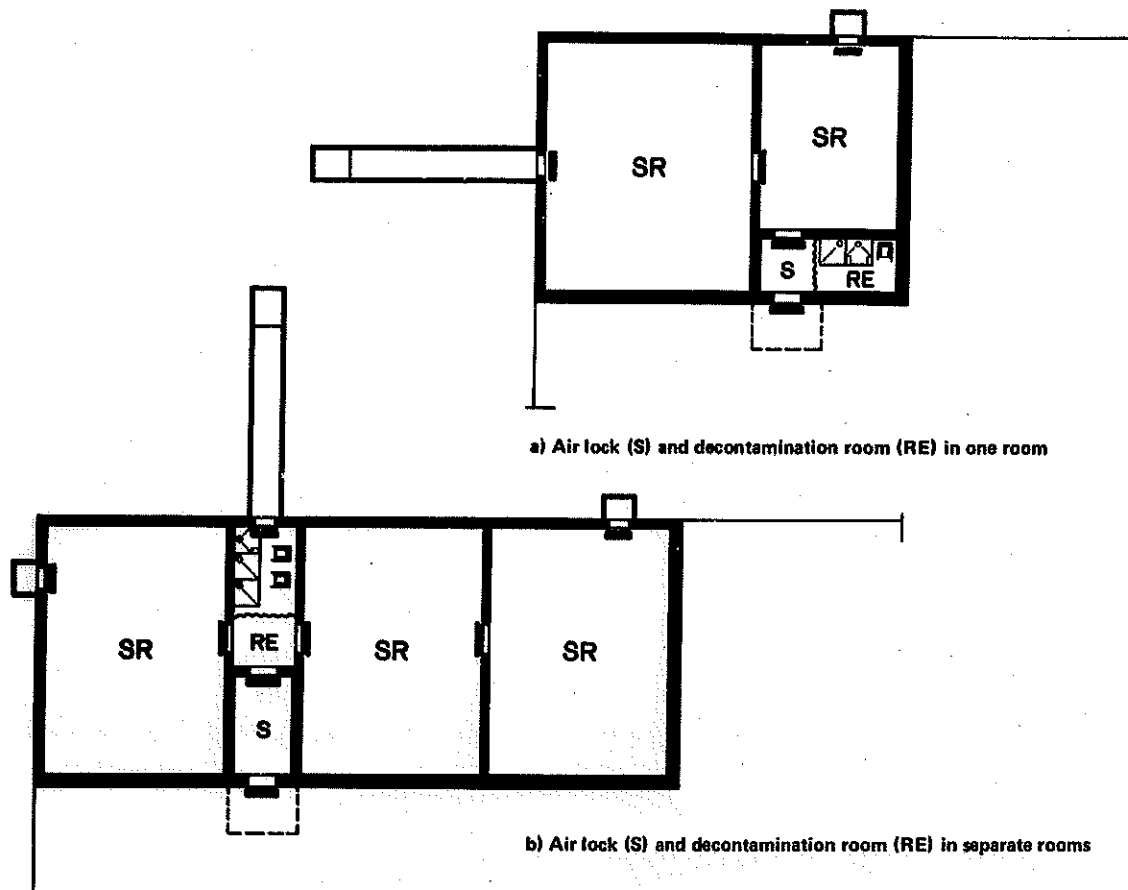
Arrangement of air locks and decontamination rooms.
